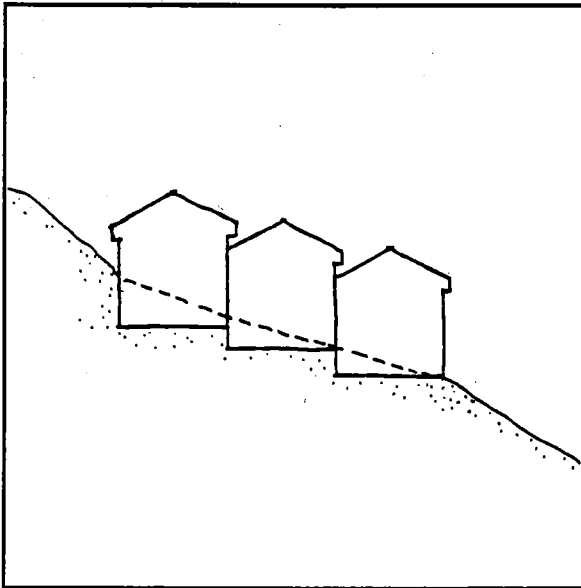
Site buildings into hillsides to incorporate them (blend-in) visually into existing hillside. Place buildings below ridge line in order to preserve natural setting.
